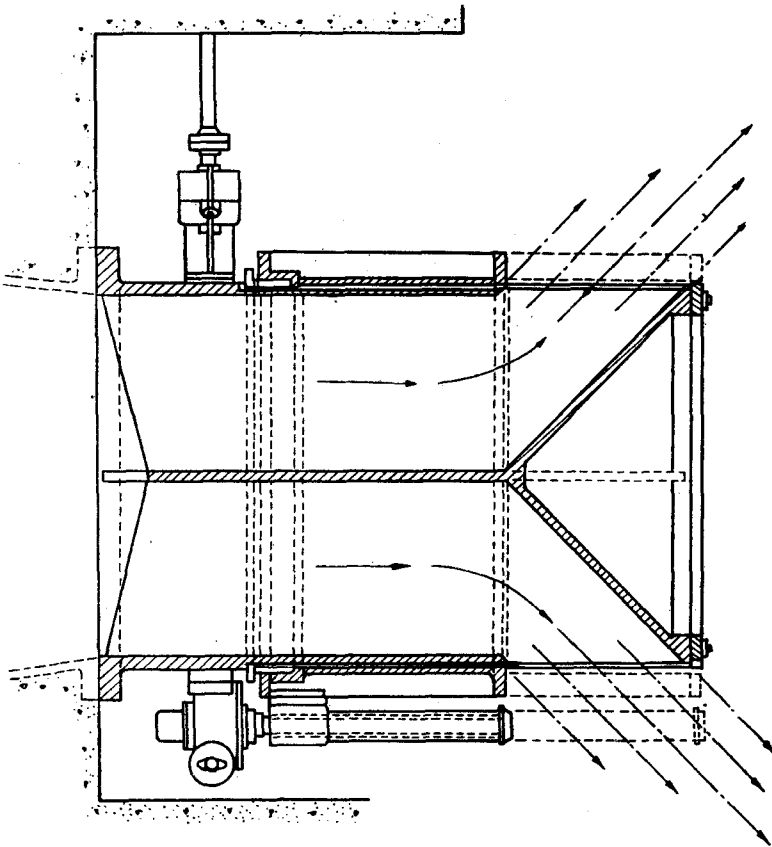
HOWELL-BUNGER VALVE/CYLINDRICAL VALVE
